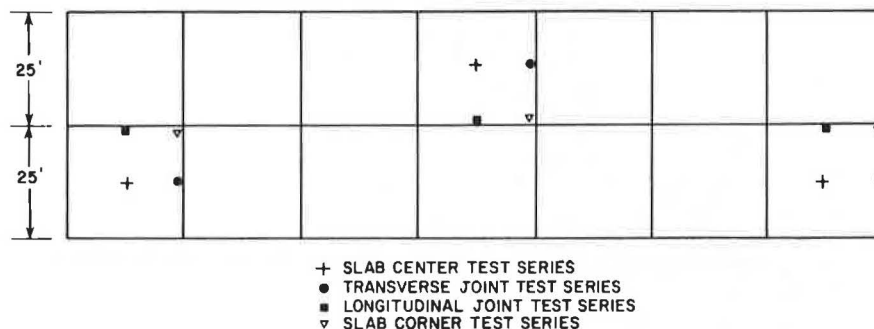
Example of test series for jointed portland cement concrete runway pavement section.
